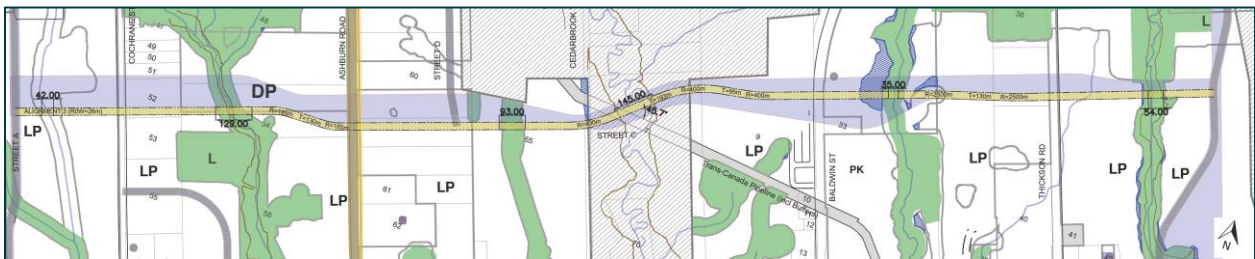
Street E (Extension of Vipond Road) Alignment Alternatives
